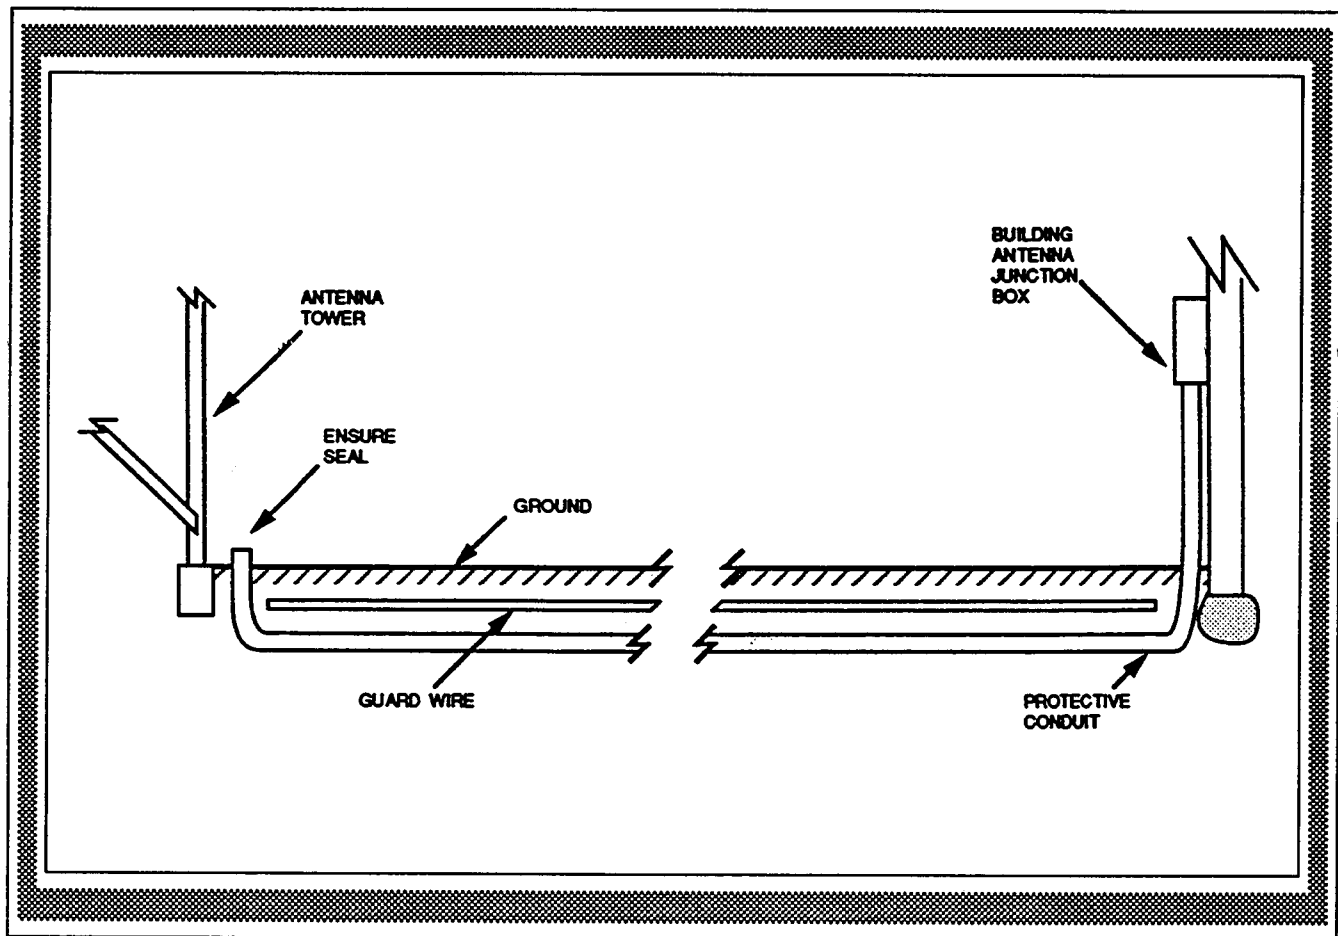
CABLE PROTECTIVE CONDUIT INSTALLATION
